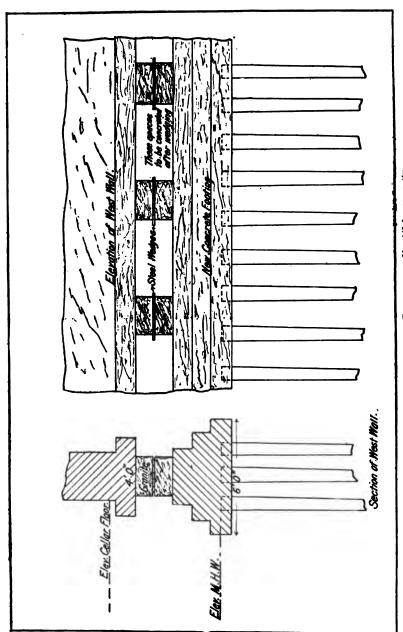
BUILDING ON FRANKLIN ST., WEST OF WEST BROADWAY.
